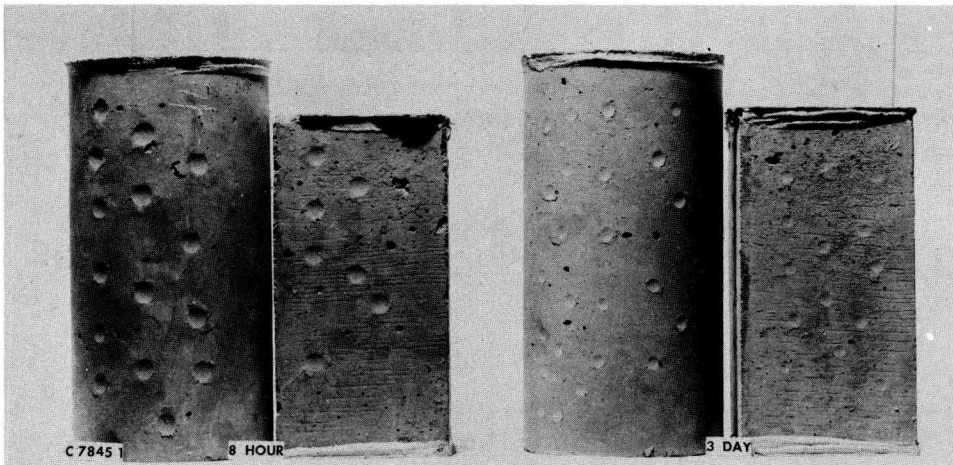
Early age specimens showing pocking due to concrete test hammer impact.
